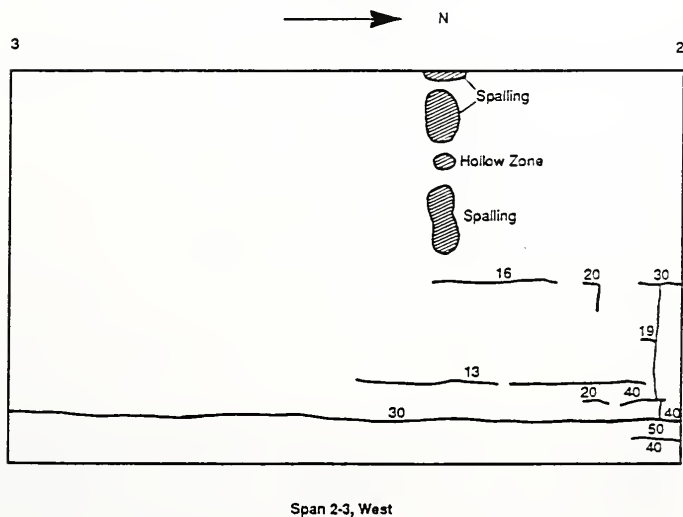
Crack Patterns, Bridge # 7-40-6527
